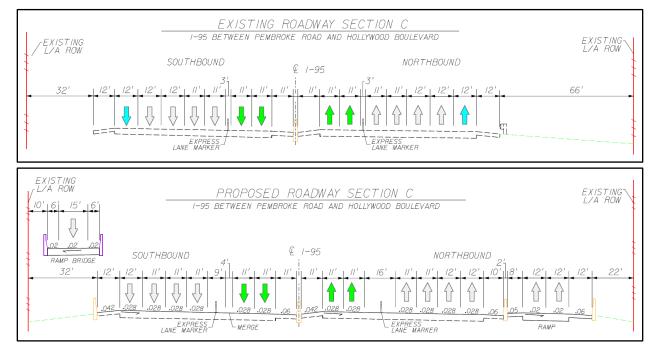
Existing Conditions and Preferred Alternative Roadway Section between Pembroke Road and Hollywood Boulevard
